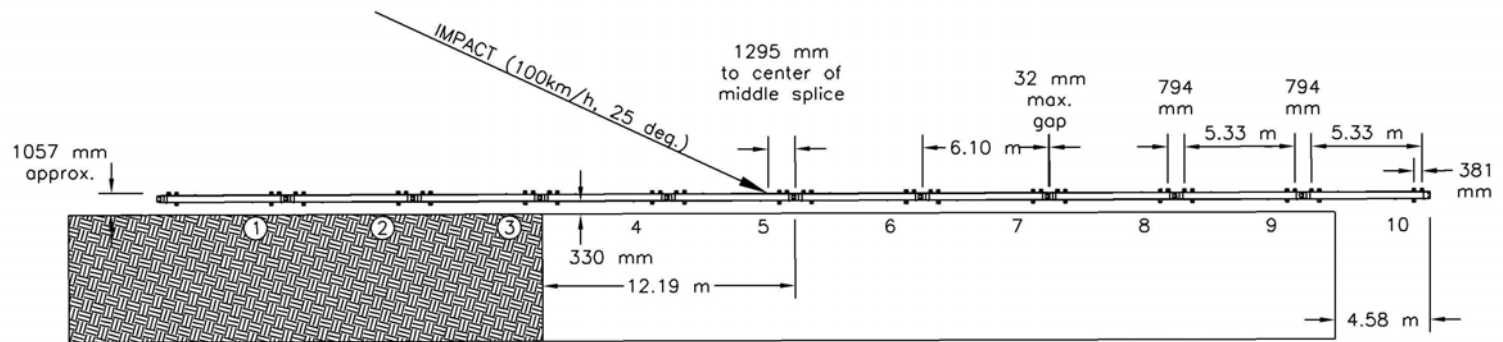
Steel H-section Temporary Barrier Details (Design No. 2)
